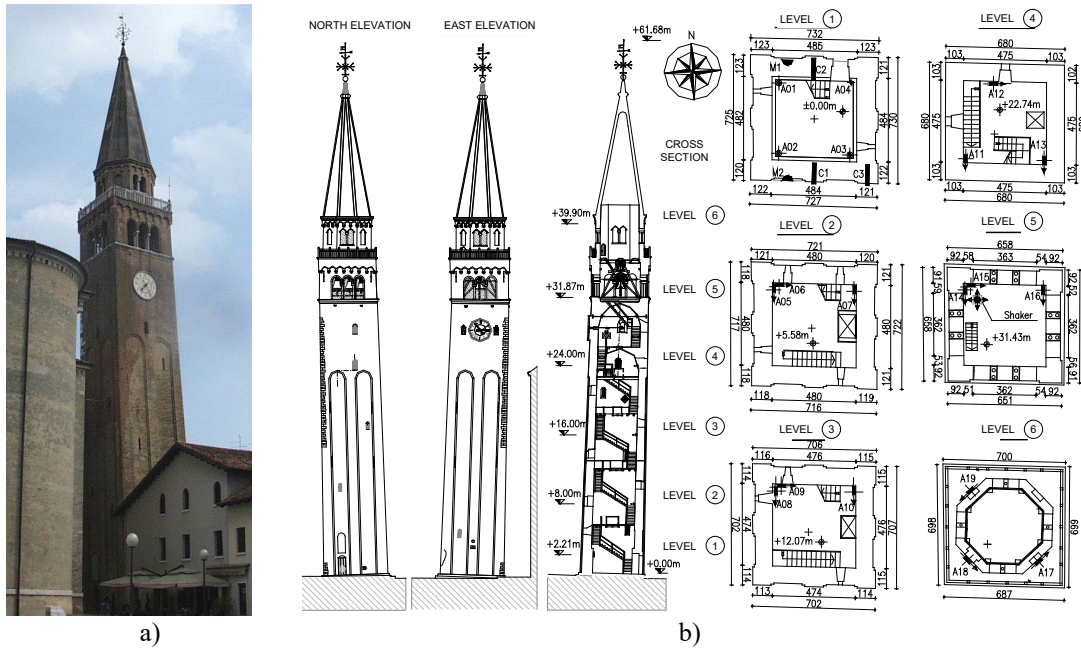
a) Bell tower of the Cathedral of Sant'Andrea (Portogruaro, VE); b) North and East elevation, cross-section and plan views at different levels
